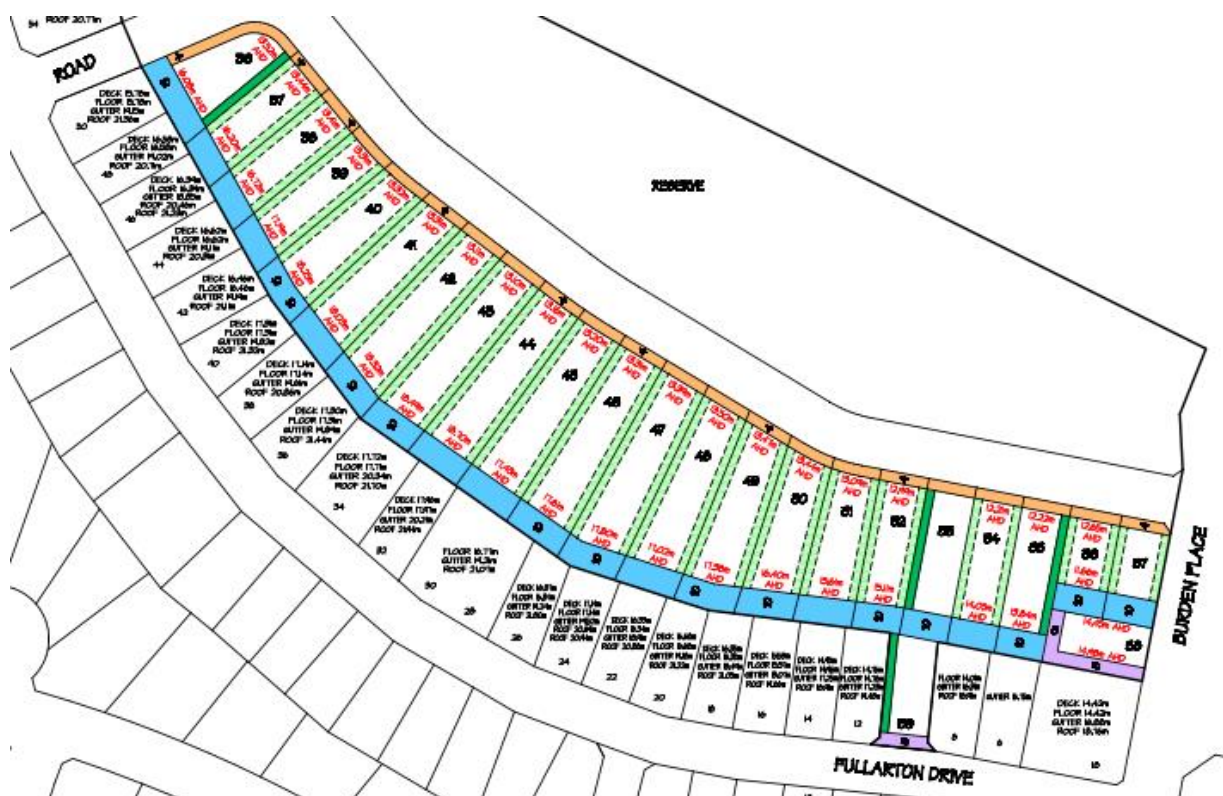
part (southern) Building Envelope Plan (v7 Crowther and Sadler 09/06/2023)
